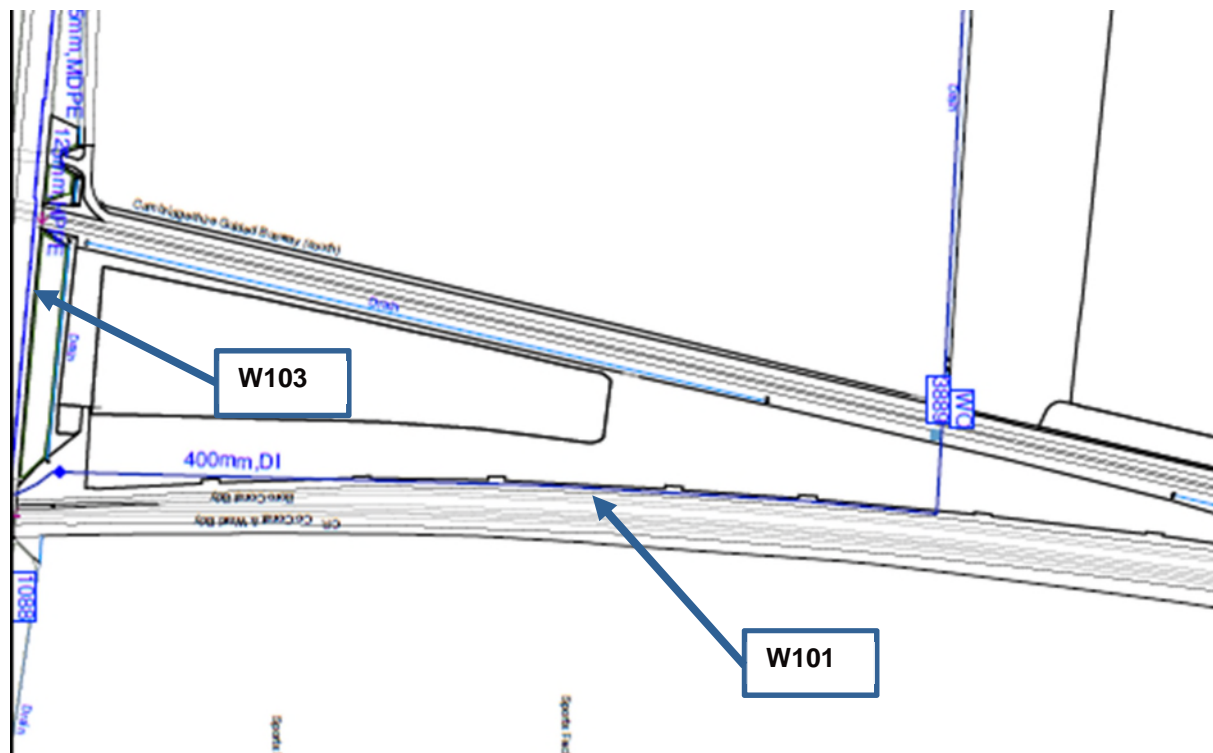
Water Services south of BGK-1544b Addenbrooke's Bridge to BGK-1544a Long Road Bridge
